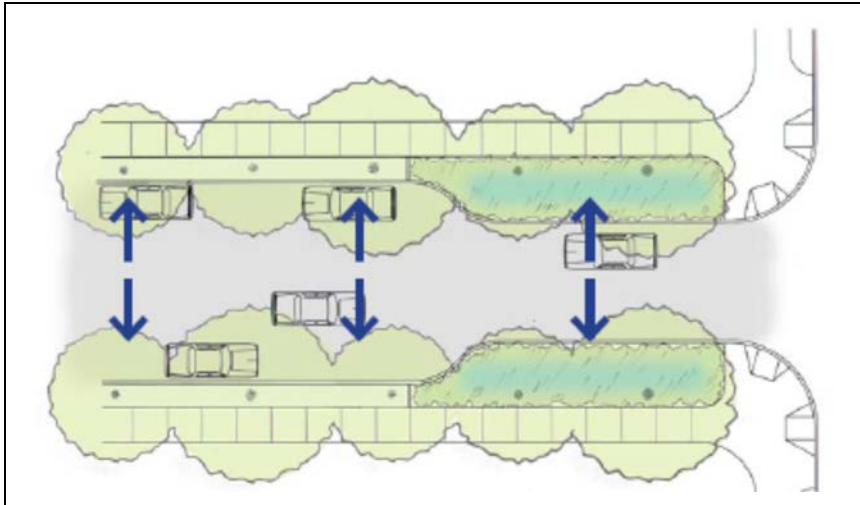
Crowned Street Profile. A crowned street is designed so that the highest elevation is in the middle of the street, such that stormwater runoff drains to the sides of the street. GI facilities may be located on either side of the street.
